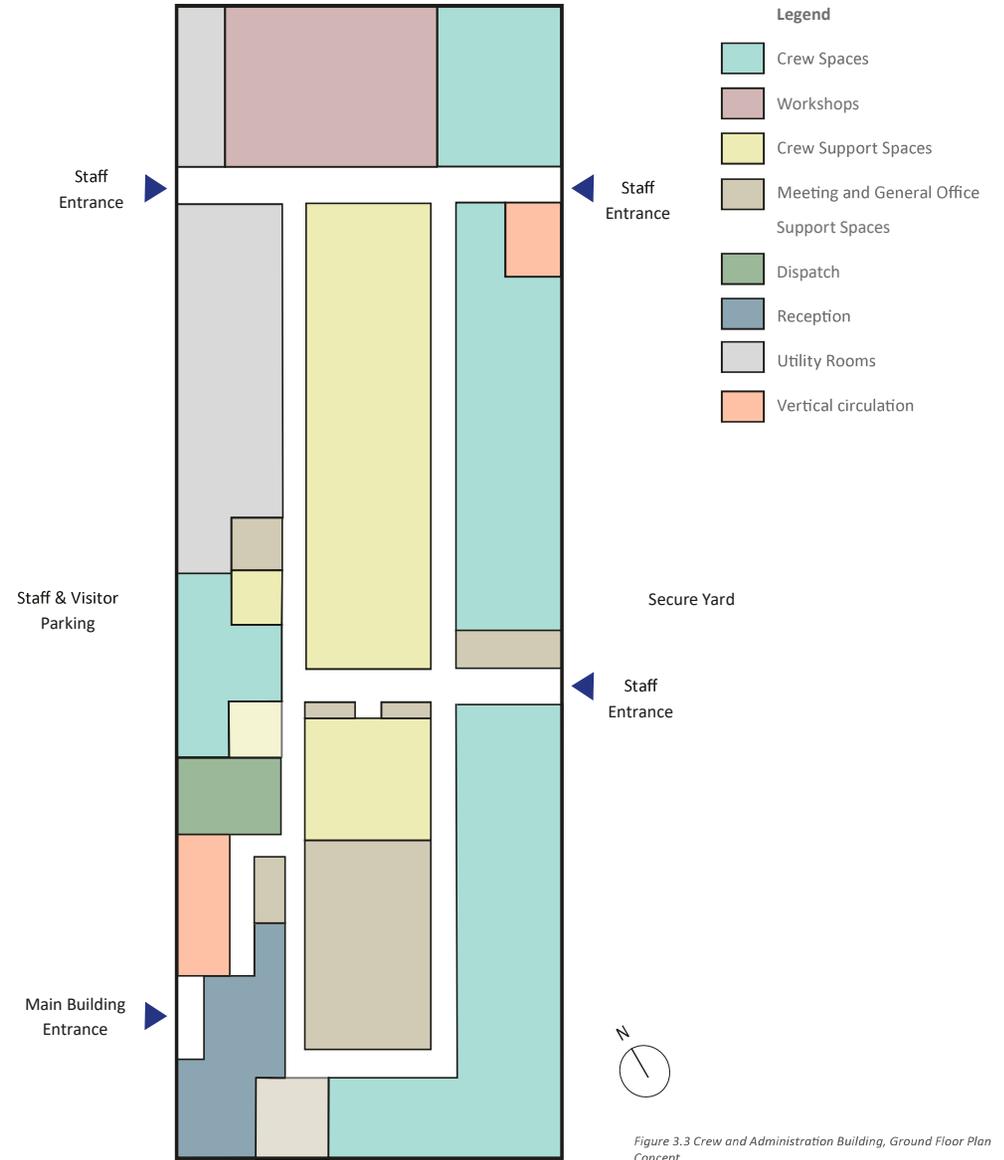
Crew and Administration Building, Ground Floor Plan Concept
